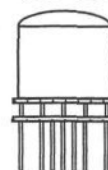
The design elevation diagram of the tank, deck, pile cap, and piling.
